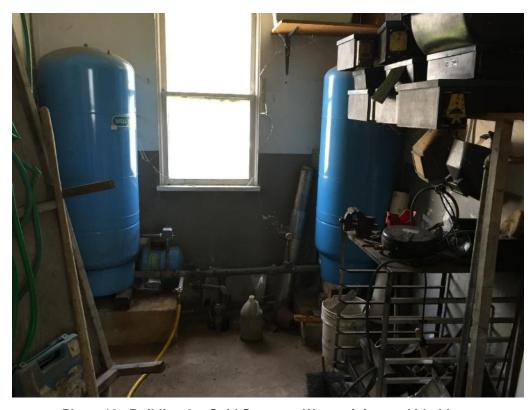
Building 3 – Cold Storage. Water piping and bladders.
